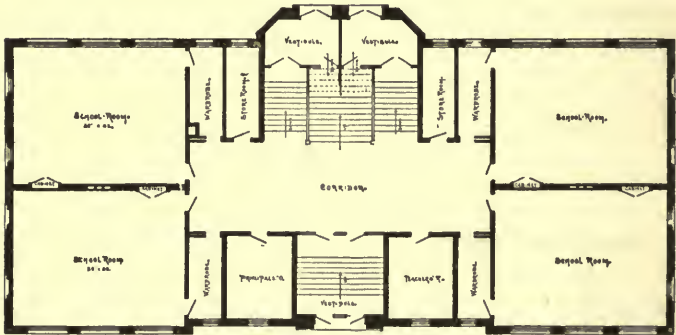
PLATE X.—FOUR-ROOM SCHOOL BUILDING.
